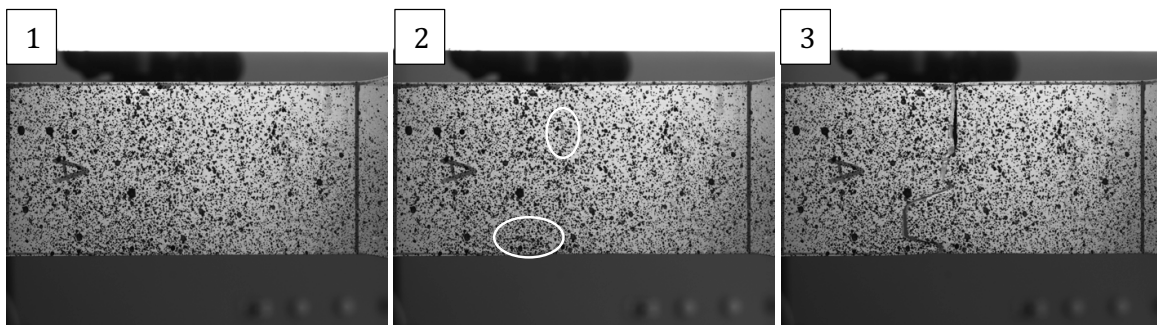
Fracture propagation of Specimen A by pictures from the test's beginning, fracture initiation and at total fracture.
